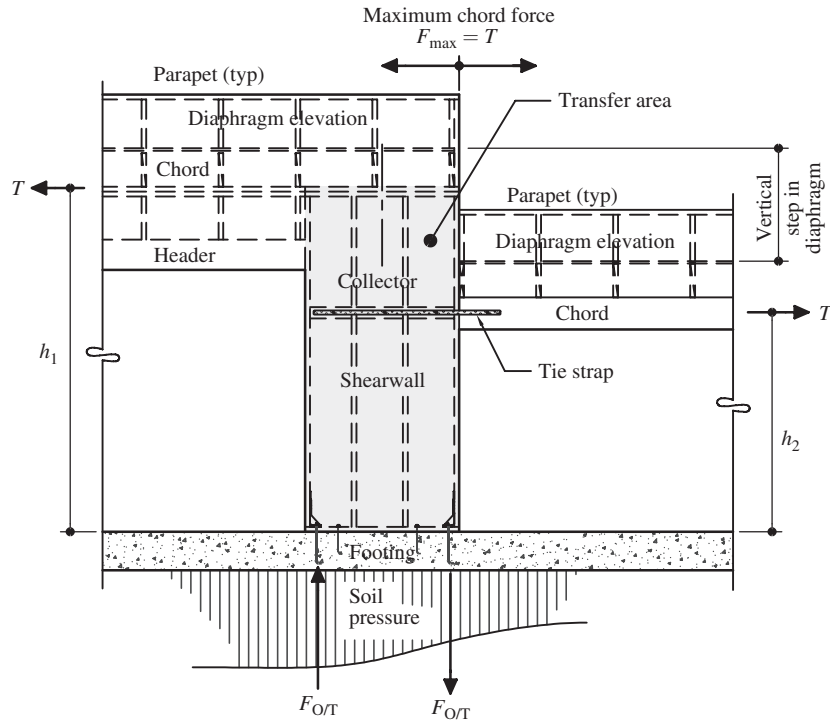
Complete load path to foundation—roof at different elevations.
